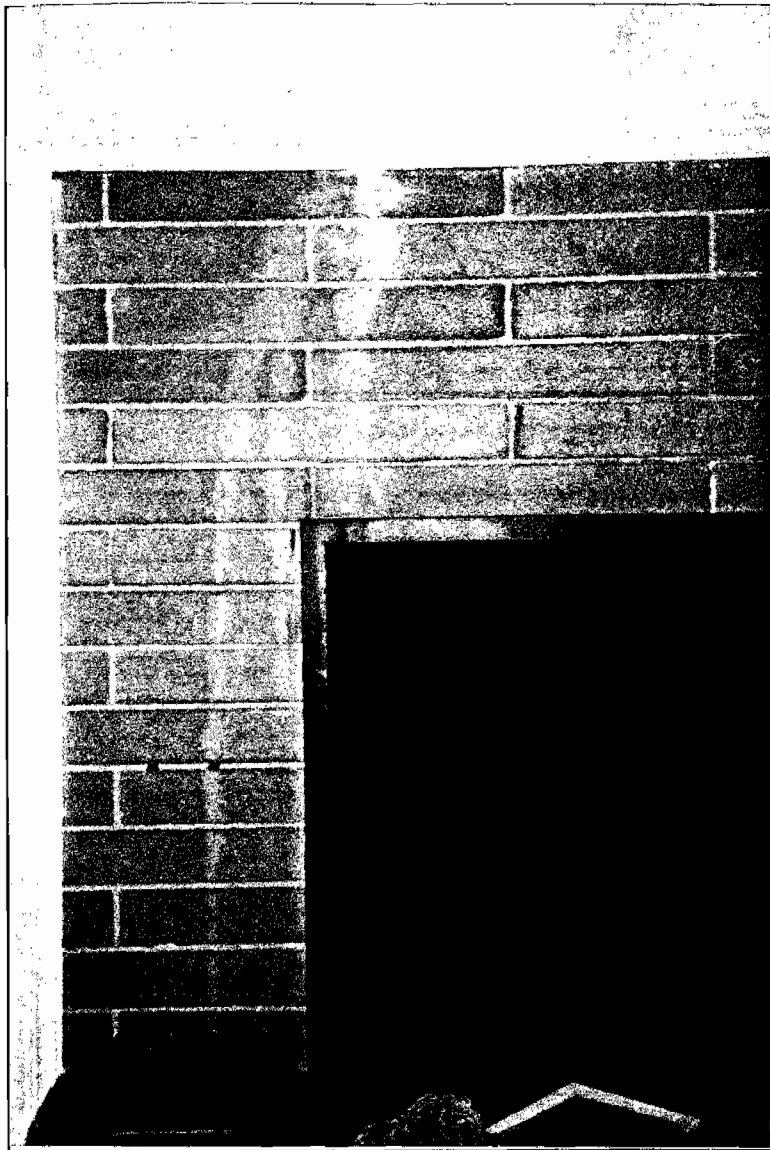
The lack of ventilation has resulting in damp conditions, leading to the deterioration of brick walls.
